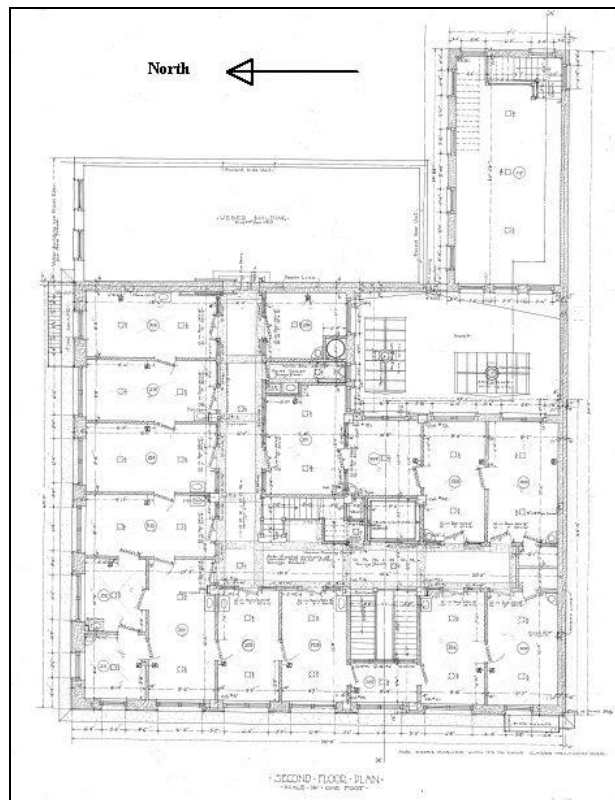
Original second floor plan (Proudfoot, Bird and Rawson, 1911)
